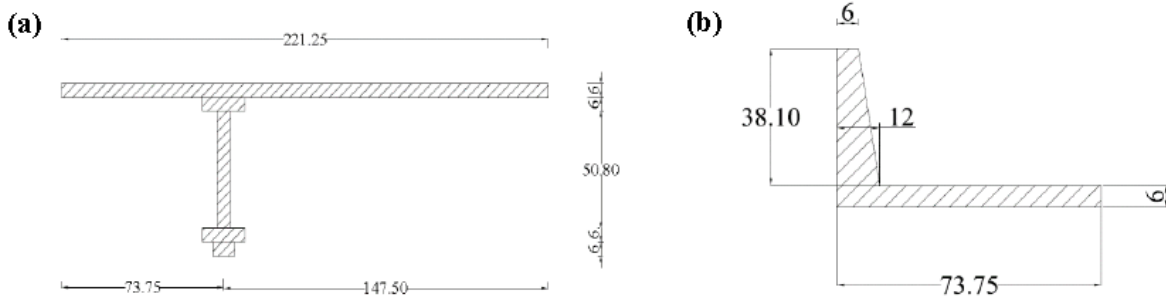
a) Exterior girder (2 and 5) effective section taken for I and J calculations. b) Exterior most girder section or barrier wall section (1 and 6). Effective section taken for I and J calculations. (All dimensions are in mm)
